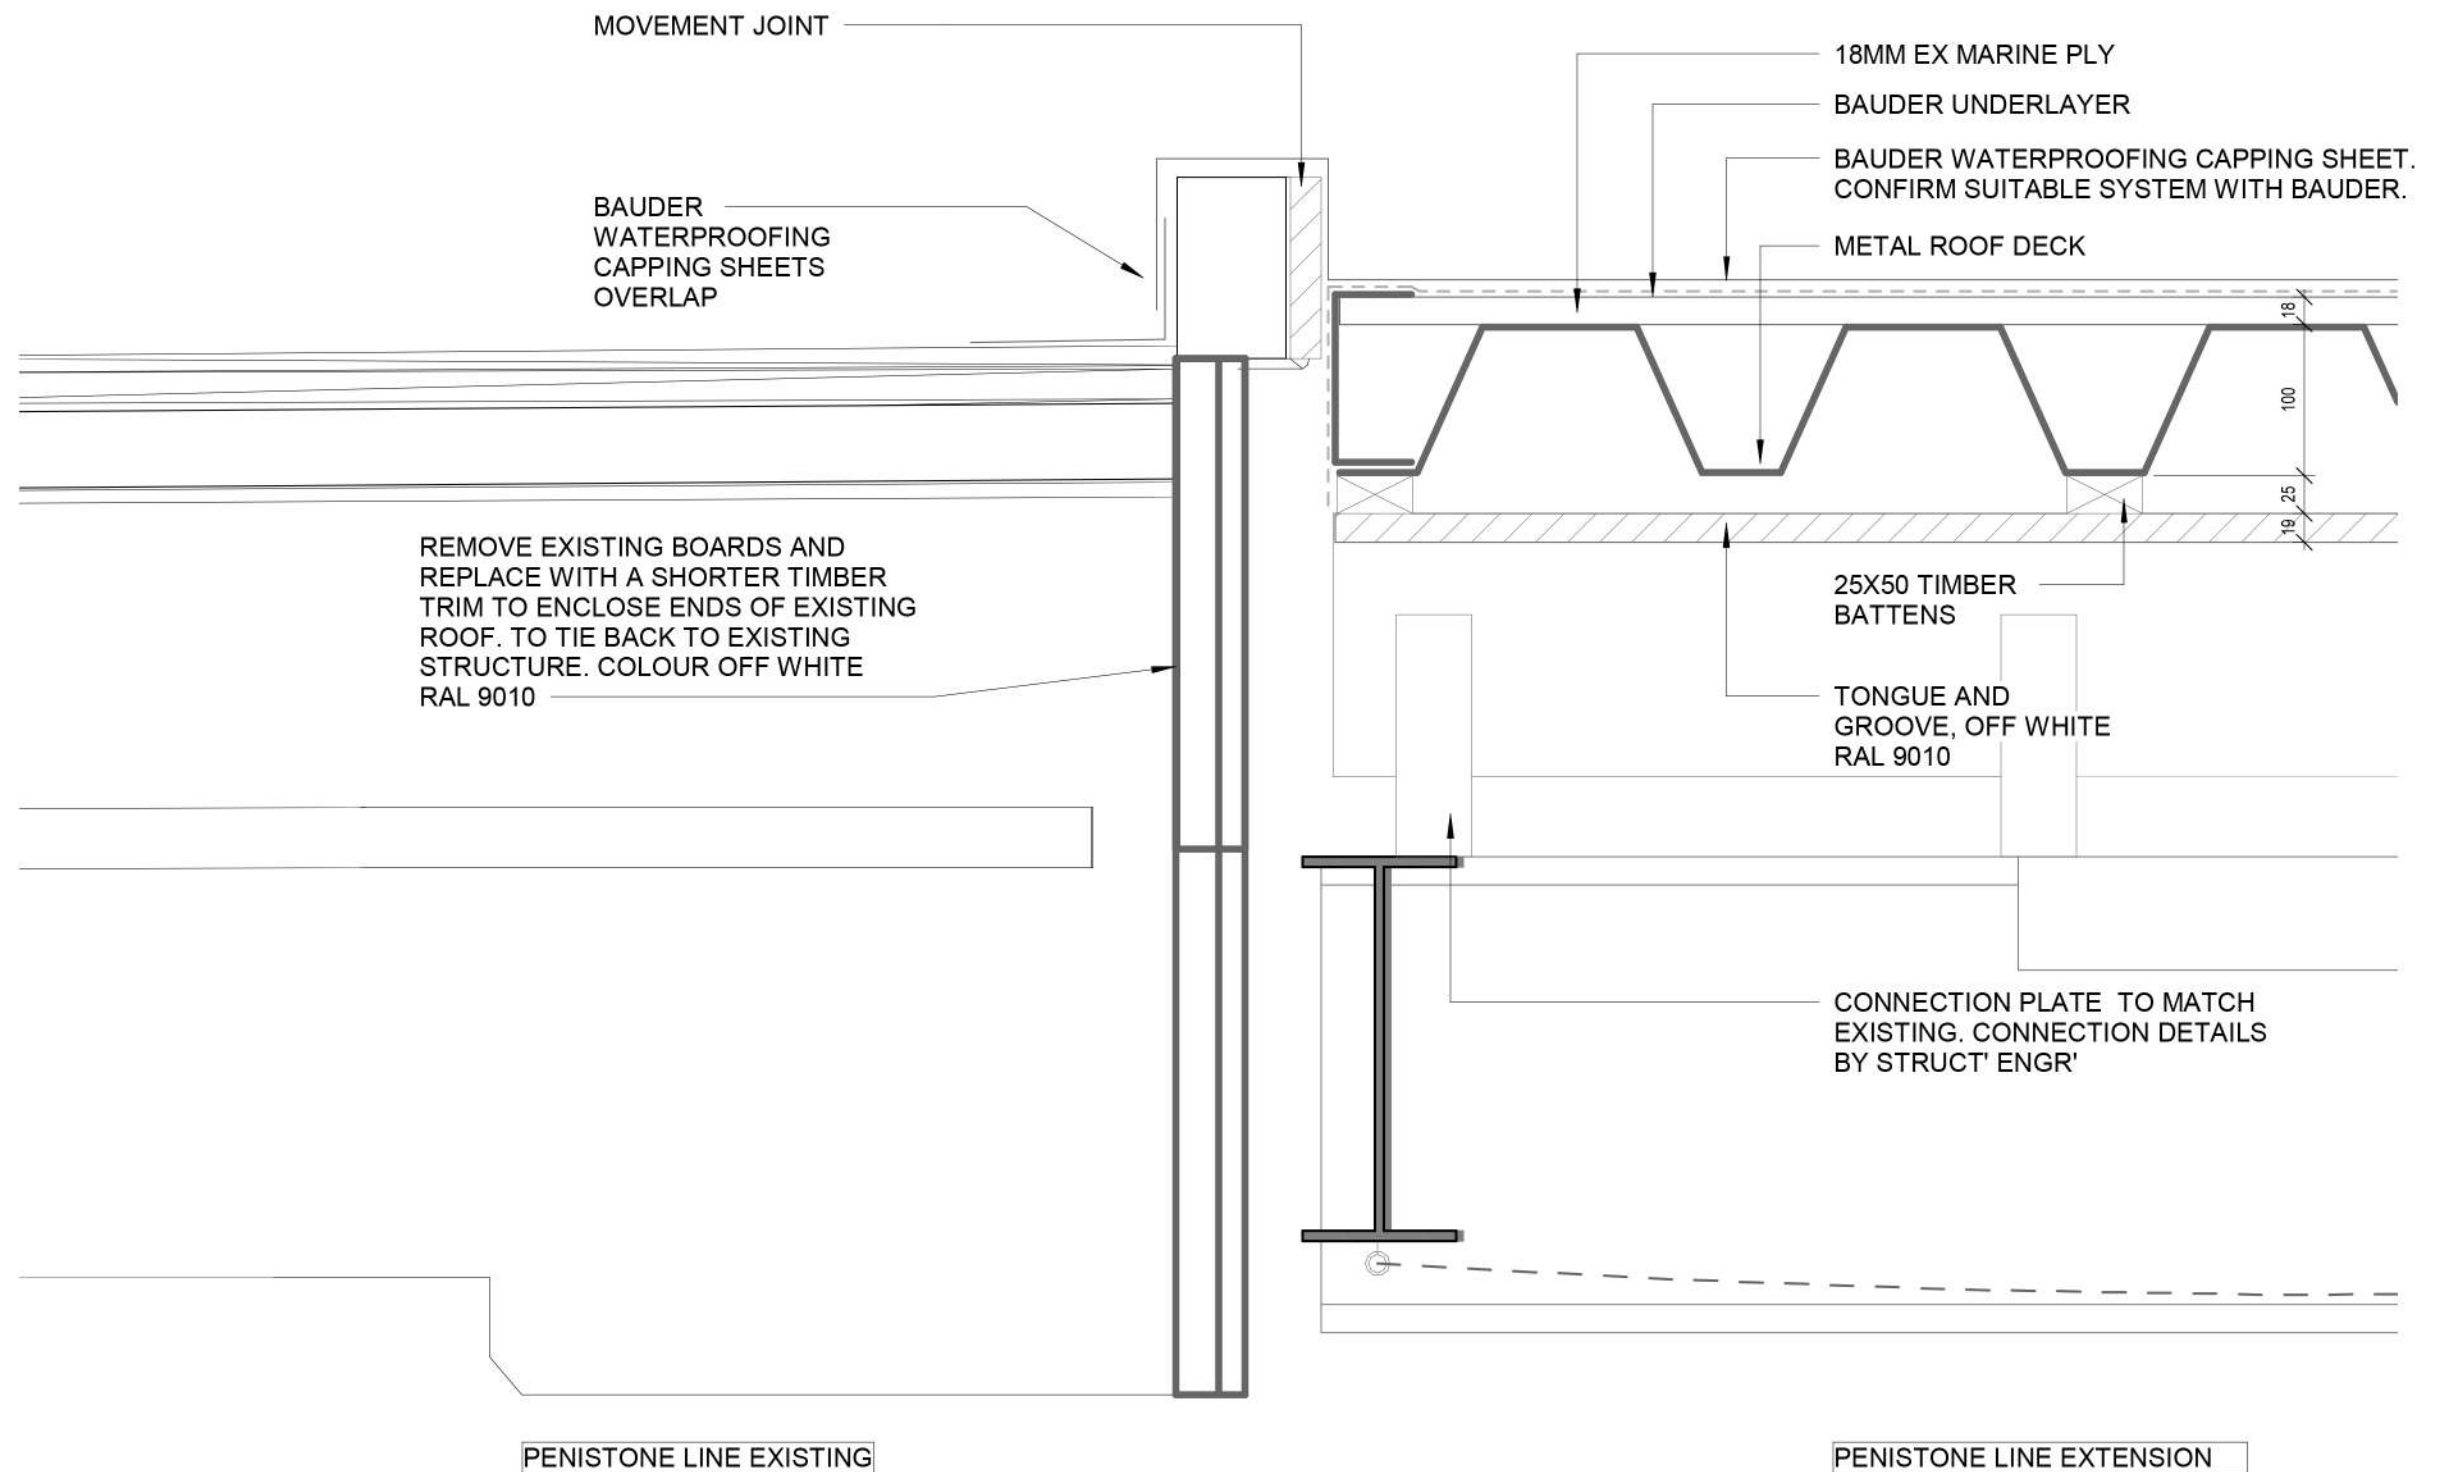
Section detail the Penistone Line proposed and existing interface
